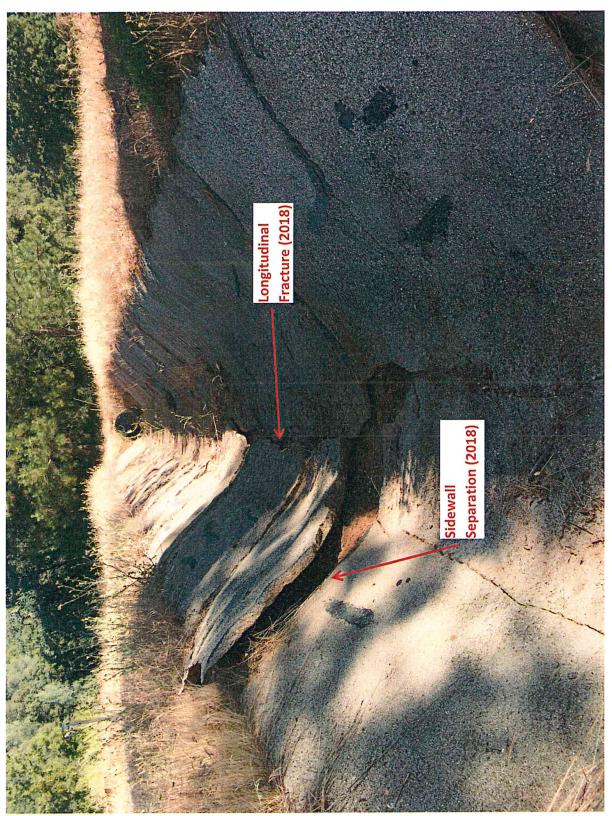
Lower Flume, Upper Section Sidewall Failure, 2018
